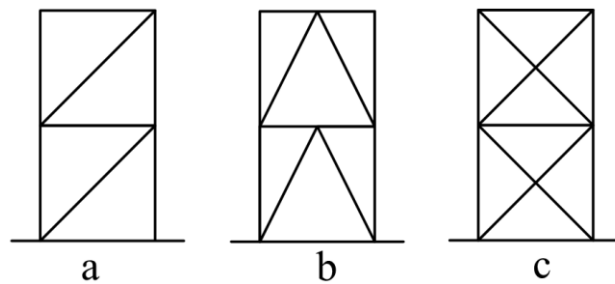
Typical concentric braced frames (a) diagonal bracing, (b) V bracing, (c) X bracing.
